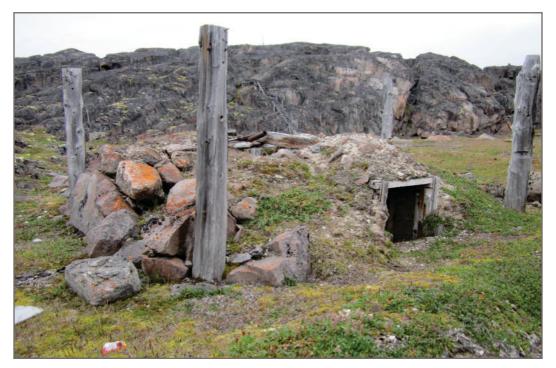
APEC 15 - Food Cache Storage - Unstable structures
